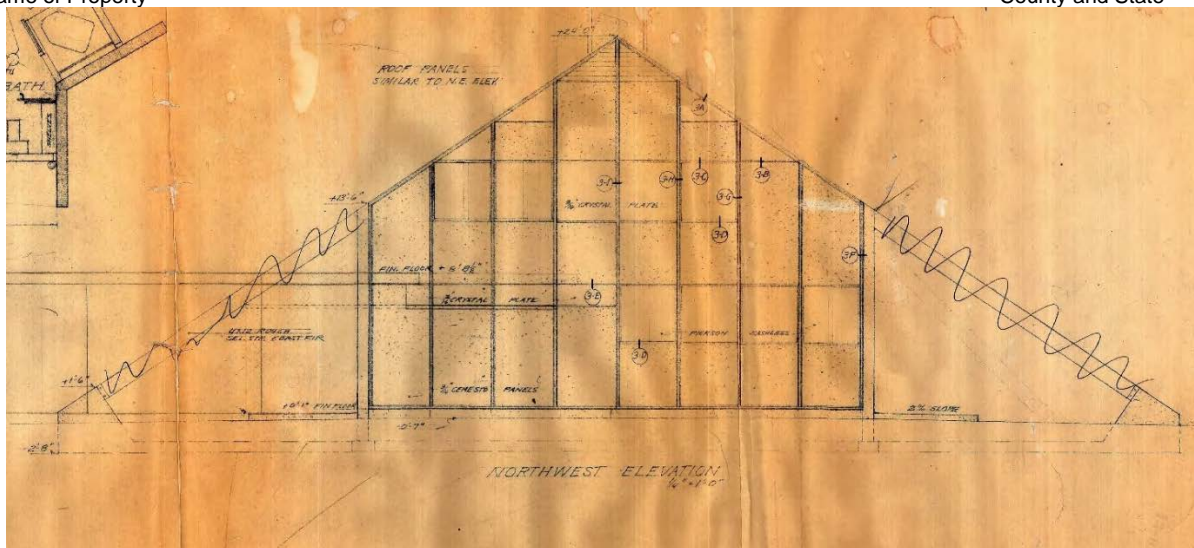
Northwest elevation, depicting roof line and elevation.²⁸
